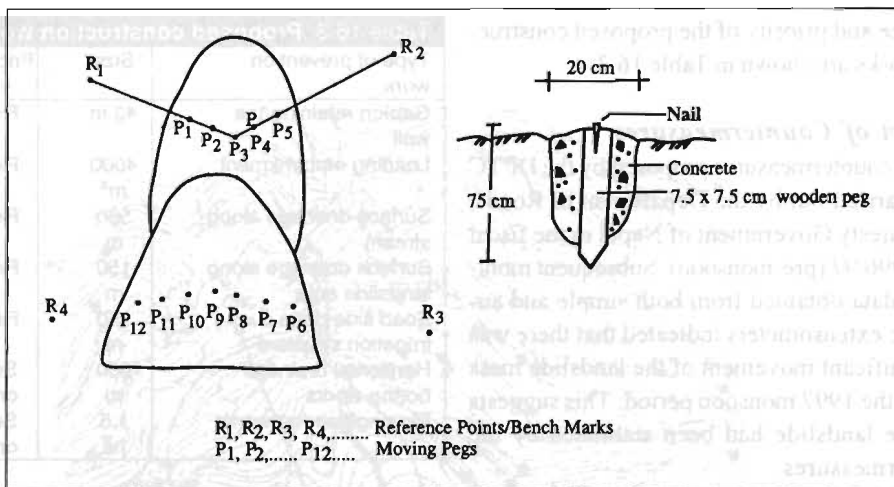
A1: Moving pegs: layout on slope and detailed plan
